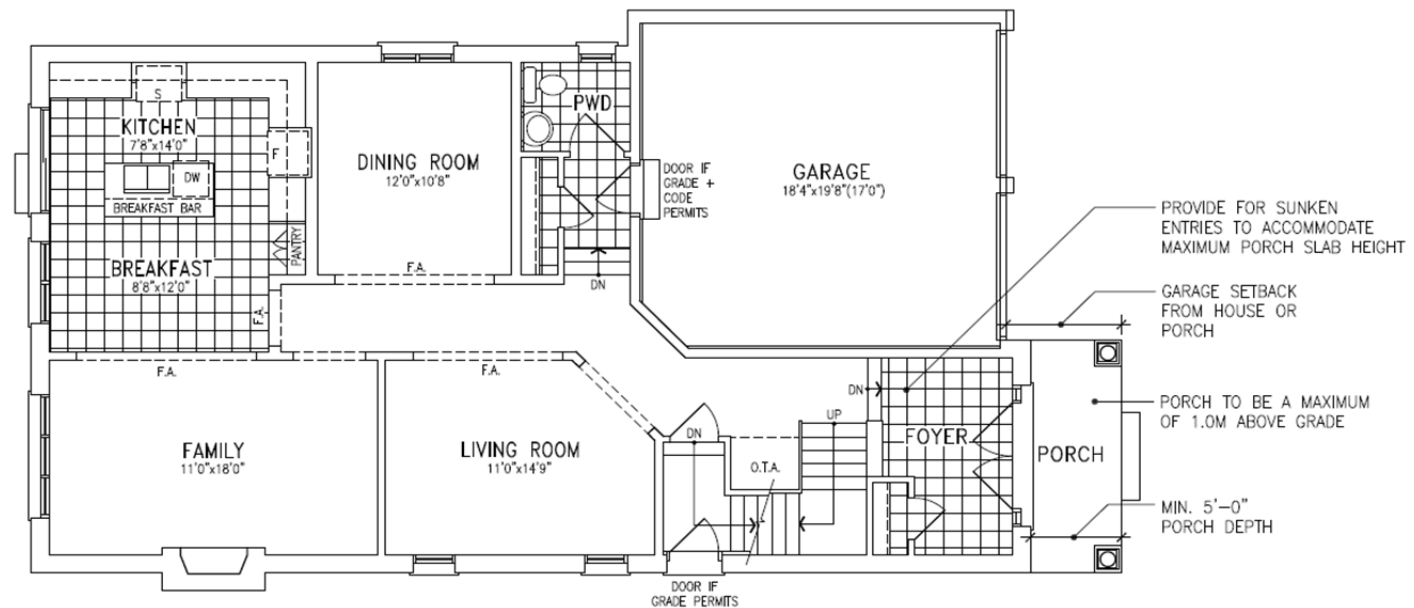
Illustrates Typical Garage Setback from Front Face of House / Porch
